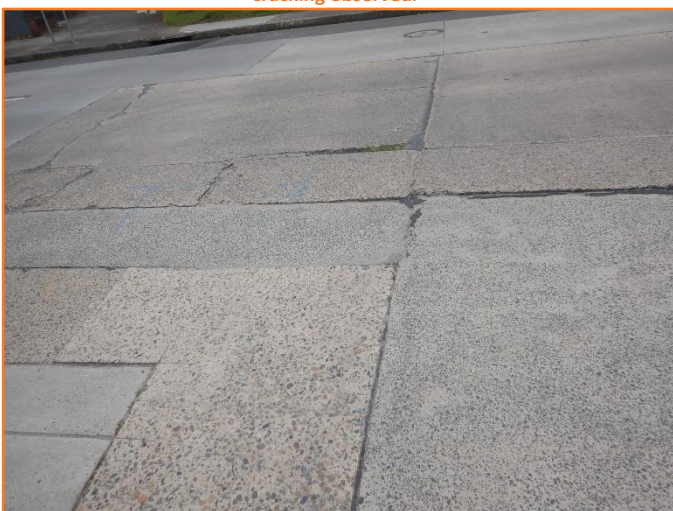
Reasonable - General condition of rigid pavement. Extensive cracking observed.
